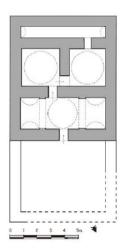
Bath Plan Sığacık Inner Castle (Ertan Daş, 2007)
